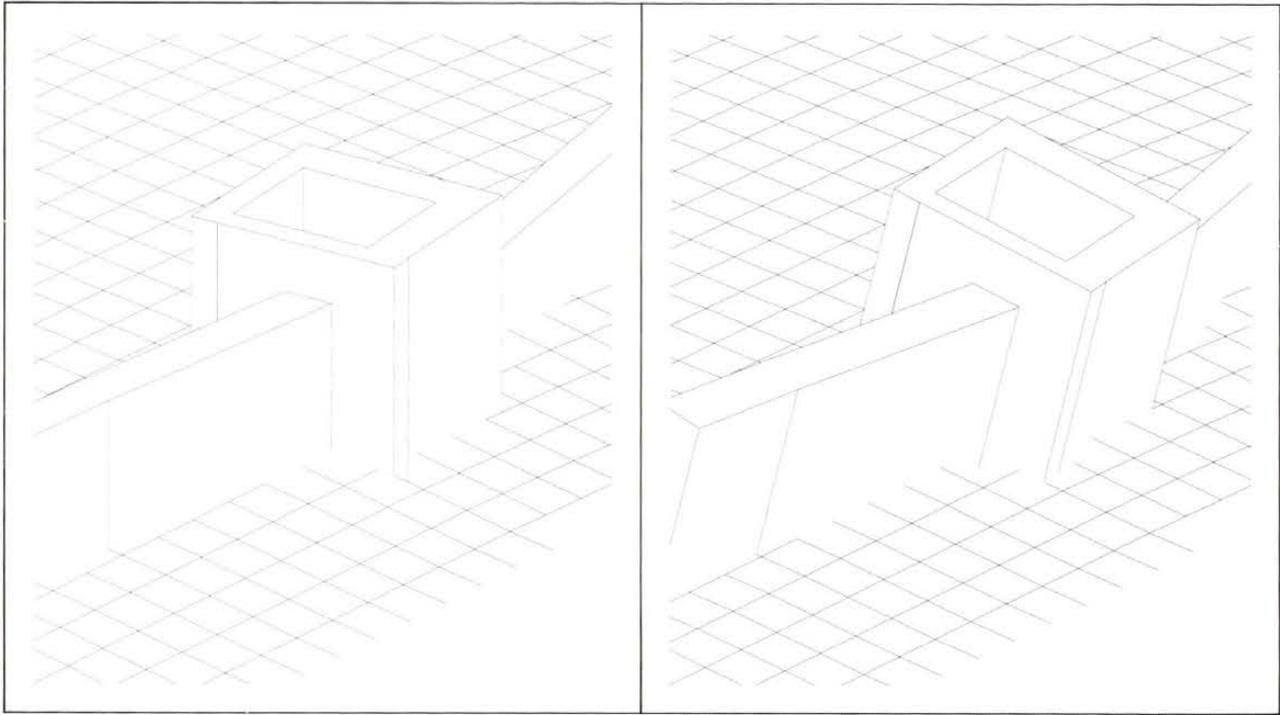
The oldest masonry-built south tower and the west section of the south wall lean by some 14-17 degrees towards the Aurajoki River (14 degrees in the illustration).
